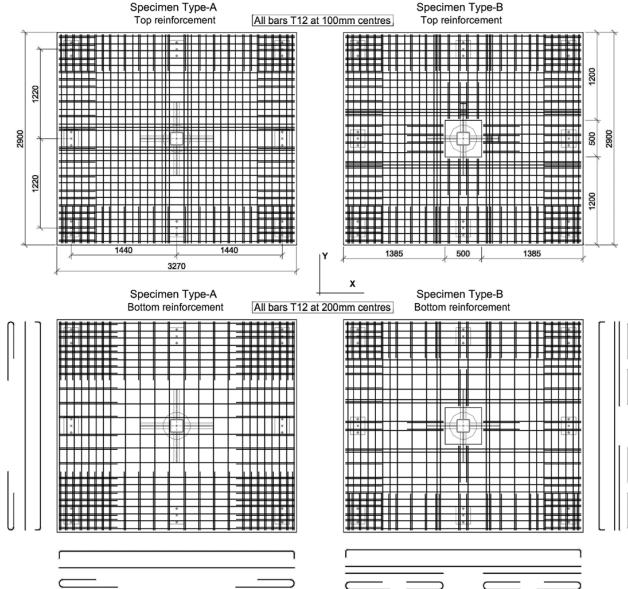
Specimen reinforcement layouts in [Eder et al. \(2011\)](#).
